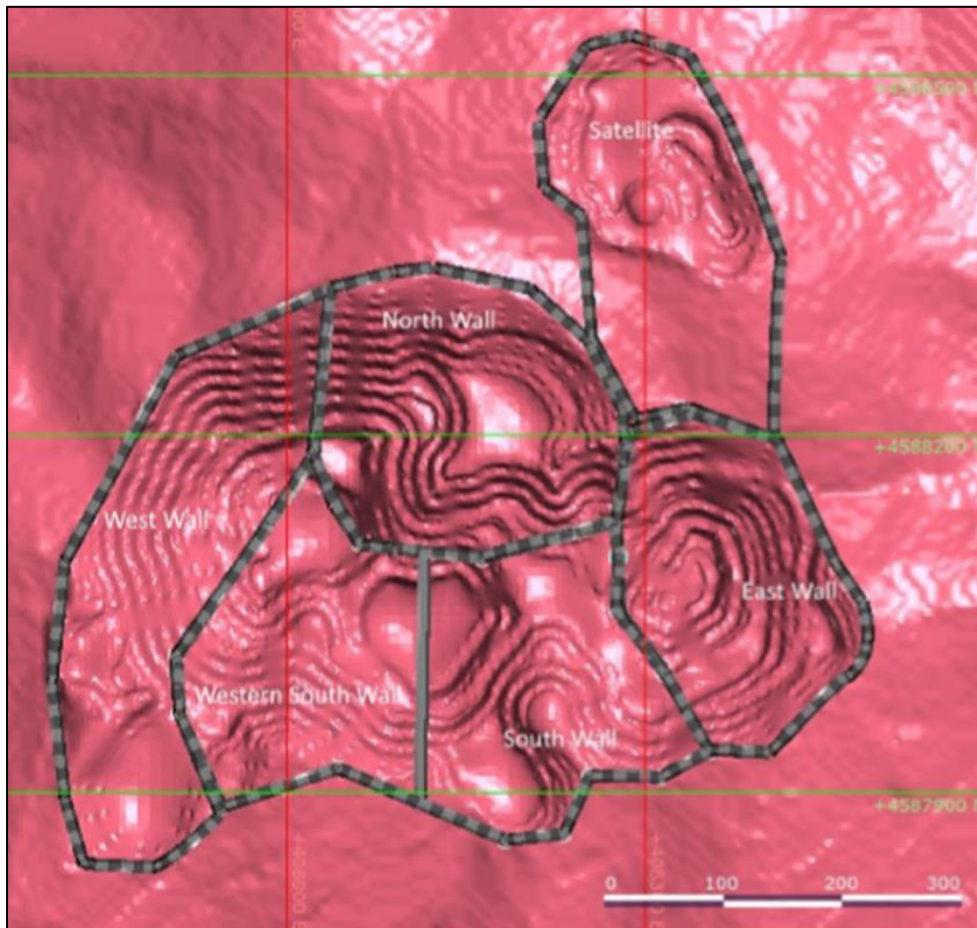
Plan of Rozino PEA pit with pit-wall domains indicated WGS 84 Zone 35N
